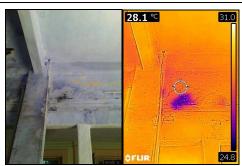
Possible Entry Point of Water Casing Leakage near Exam Section (First Floor)
